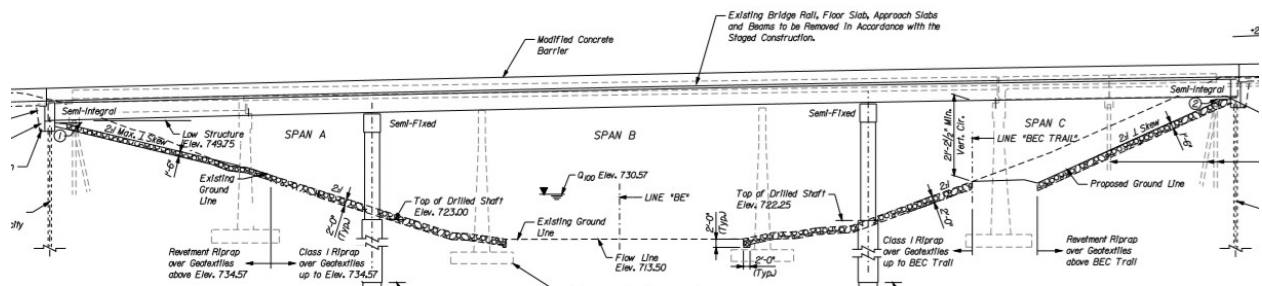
Elevation View of the Bridge (NBI 50795) (2009)
